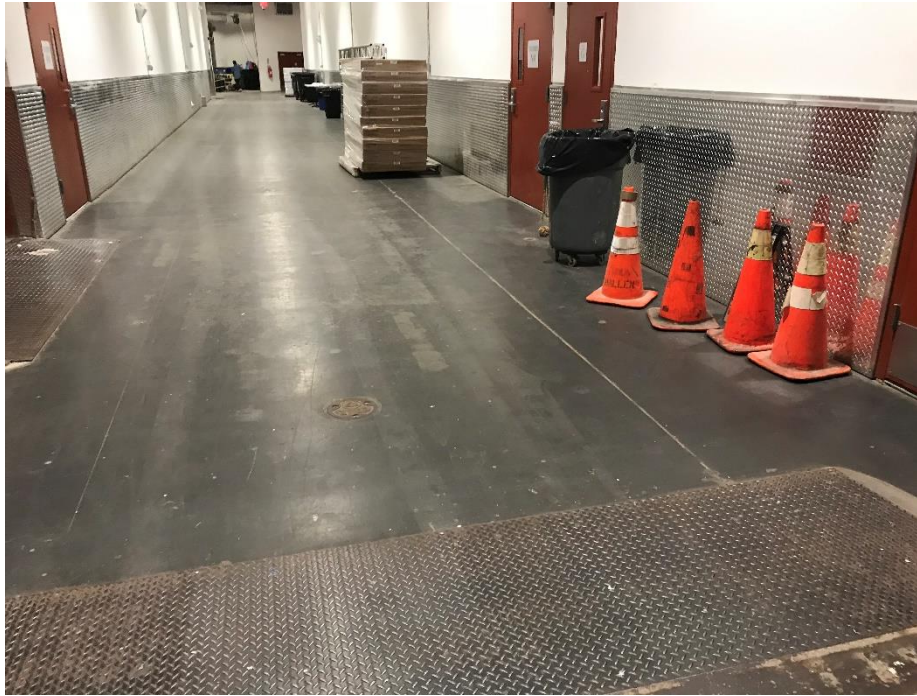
View of central hallway, facing east. Taken on 09/13/2019.
